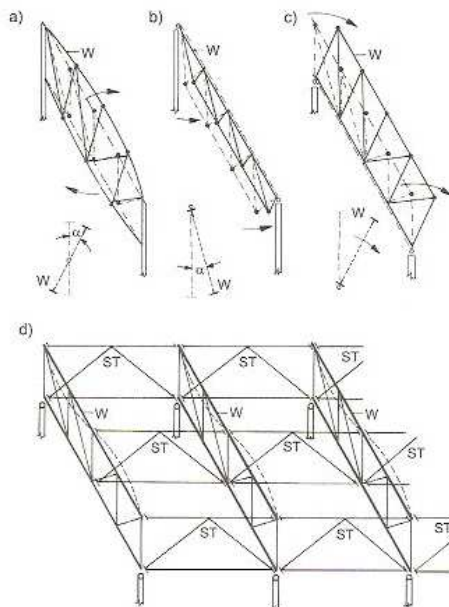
Possible lateral deformations of truss rafter: W- rafter, ST- bracing, a),b) tilting, c) turn over
